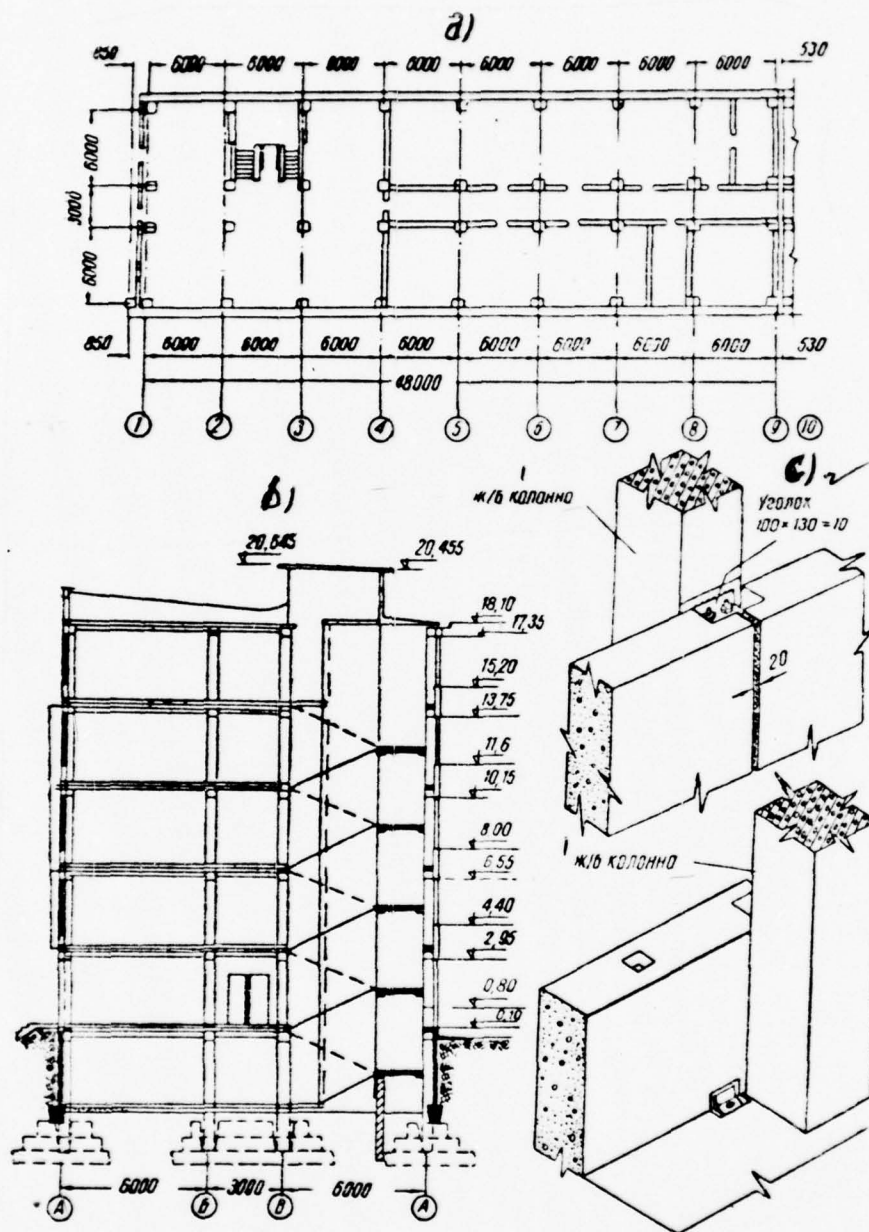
Plan/layout for standard floor/stage (a), the cut/section of building (b), of the fastening of wall panels (c), the internal attachment of wall panel (d).
